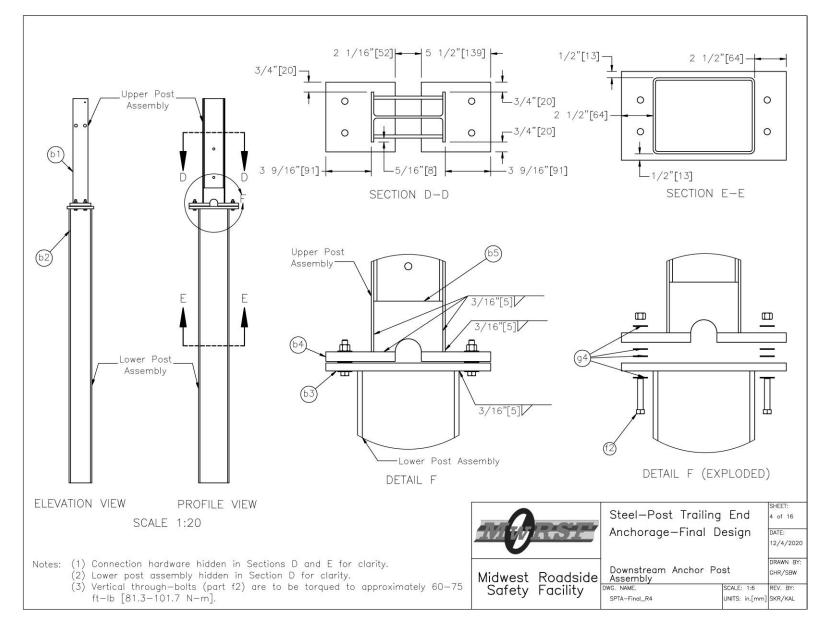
Steel-Post Trailing End Anchorage, Downstream Anchor Post Assembly
